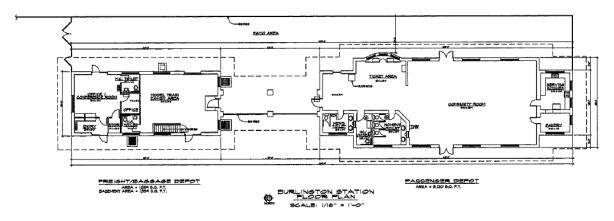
Interior Plan, Burlington Depot, 2002. Webb & Co. Architects.
